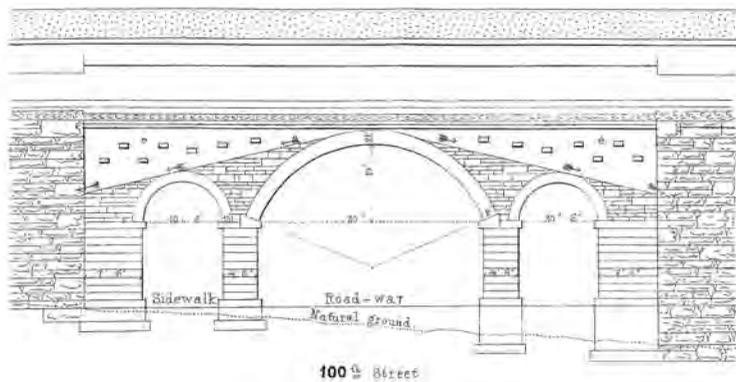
Sections of elevated aqueduct through the Clendening Valley showing arched passageways for roads and sidewalks.
